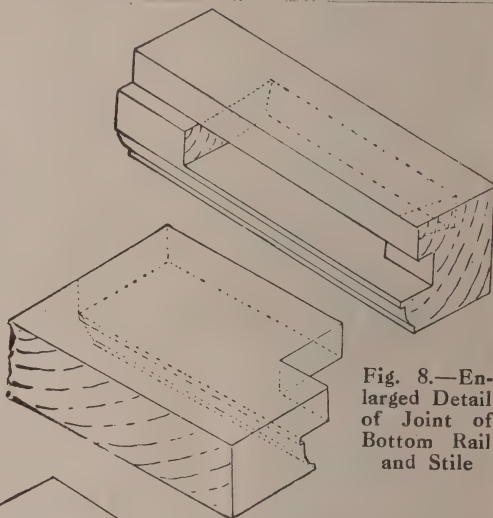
Enlarged Detail of Joint of Bottom Rail and Stile
